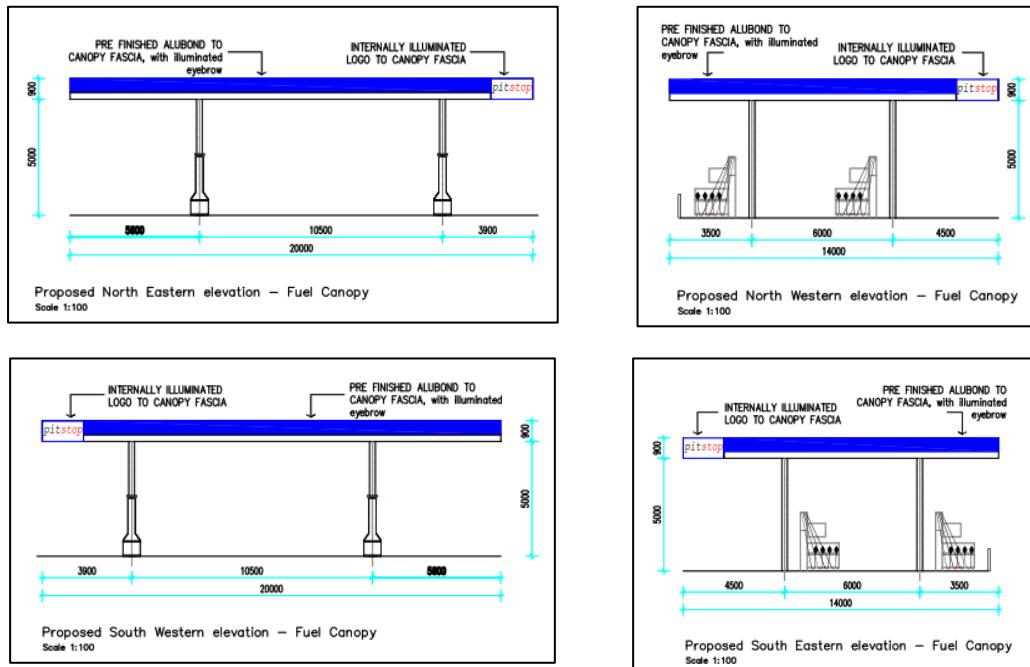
Proposed elevations of fuel canopy (Source: Badaoui Group, 2025)
